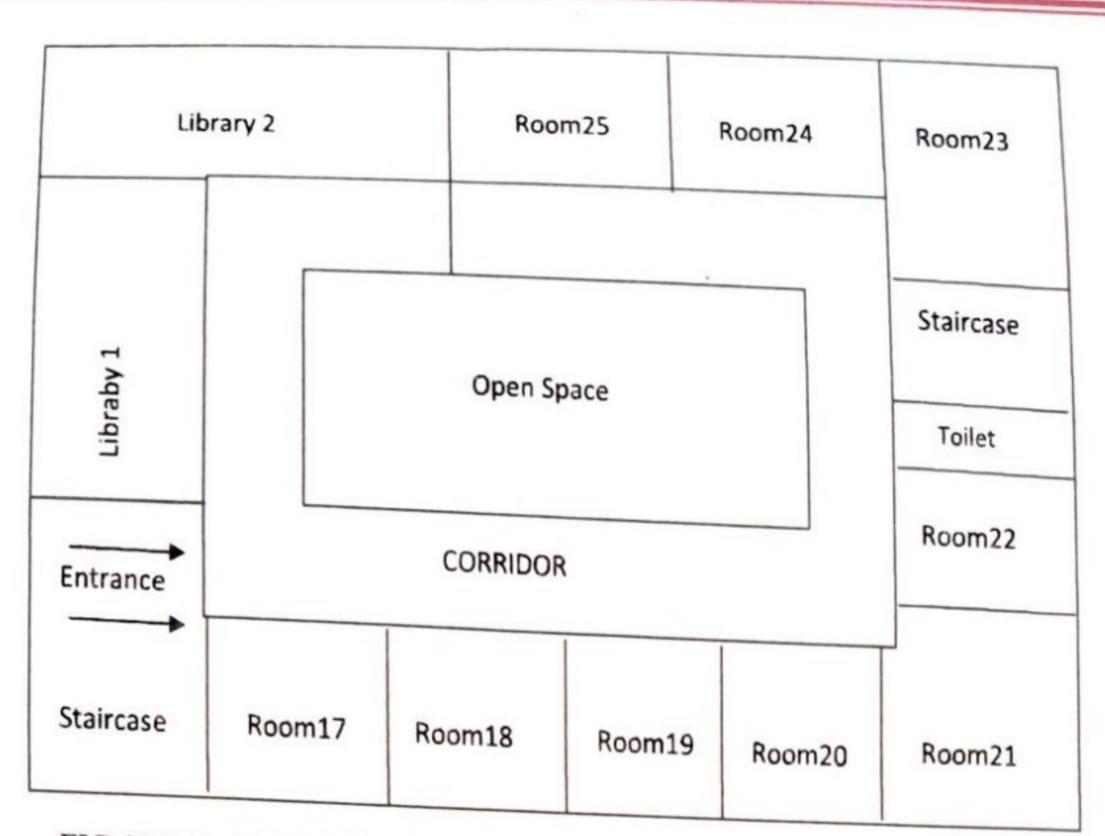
FIRST FLOOR PLAN (Building No.1)
